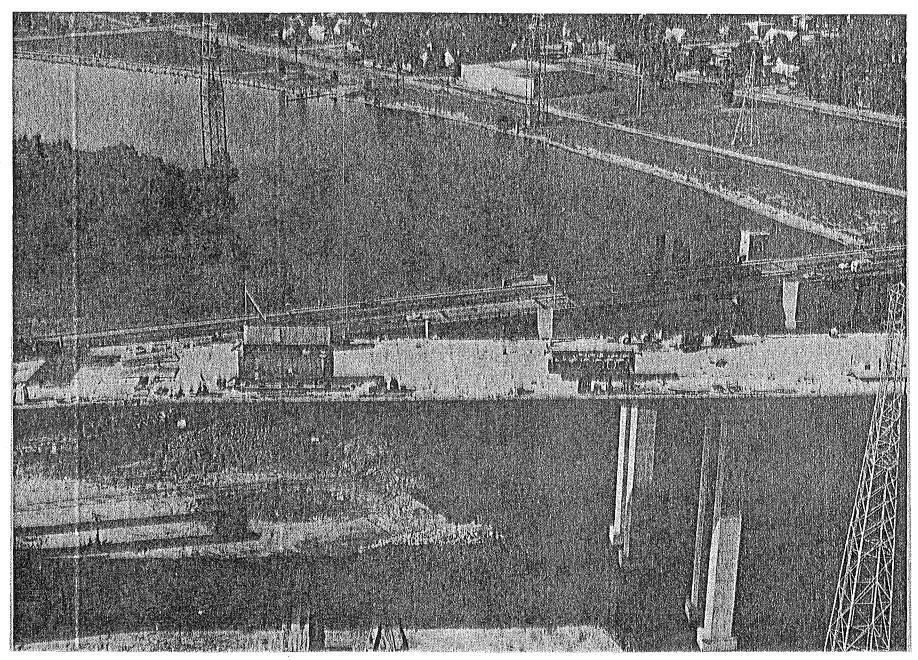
Aerial view of Span 12 and Pier 12N
